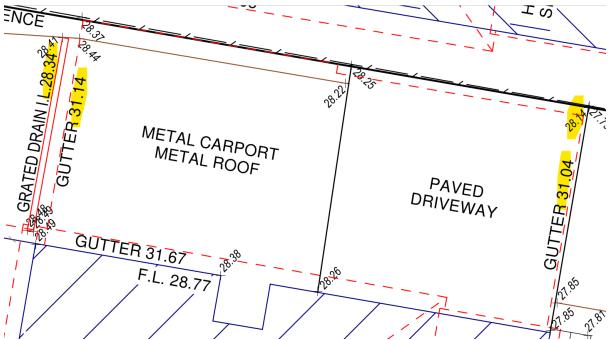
Extract of the survey plan, showing the existing carport (source: Sydney Surveyors)
